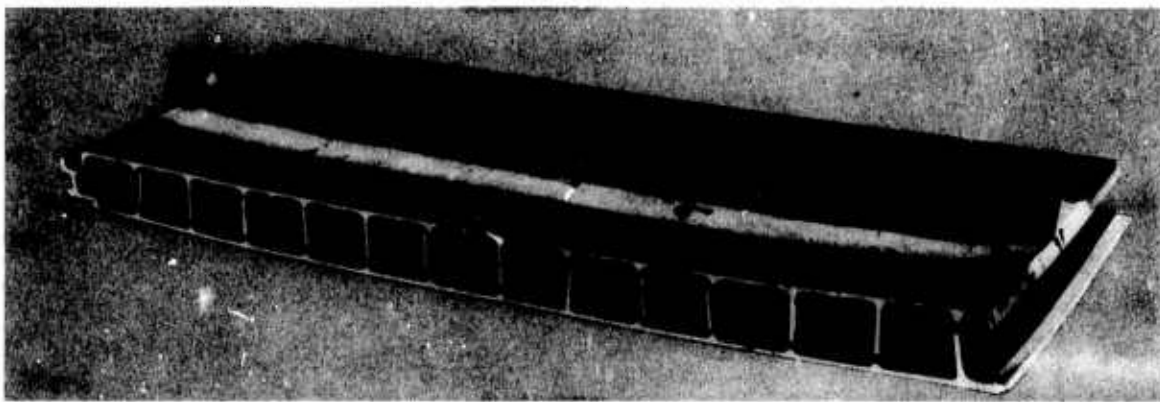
Core failure in item 2 after 150 passes of 33,000-lb single-wheel load
